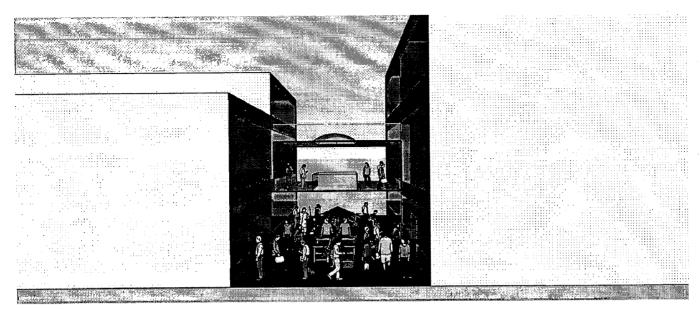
Section of Proposed mall at Ranganathan Street
